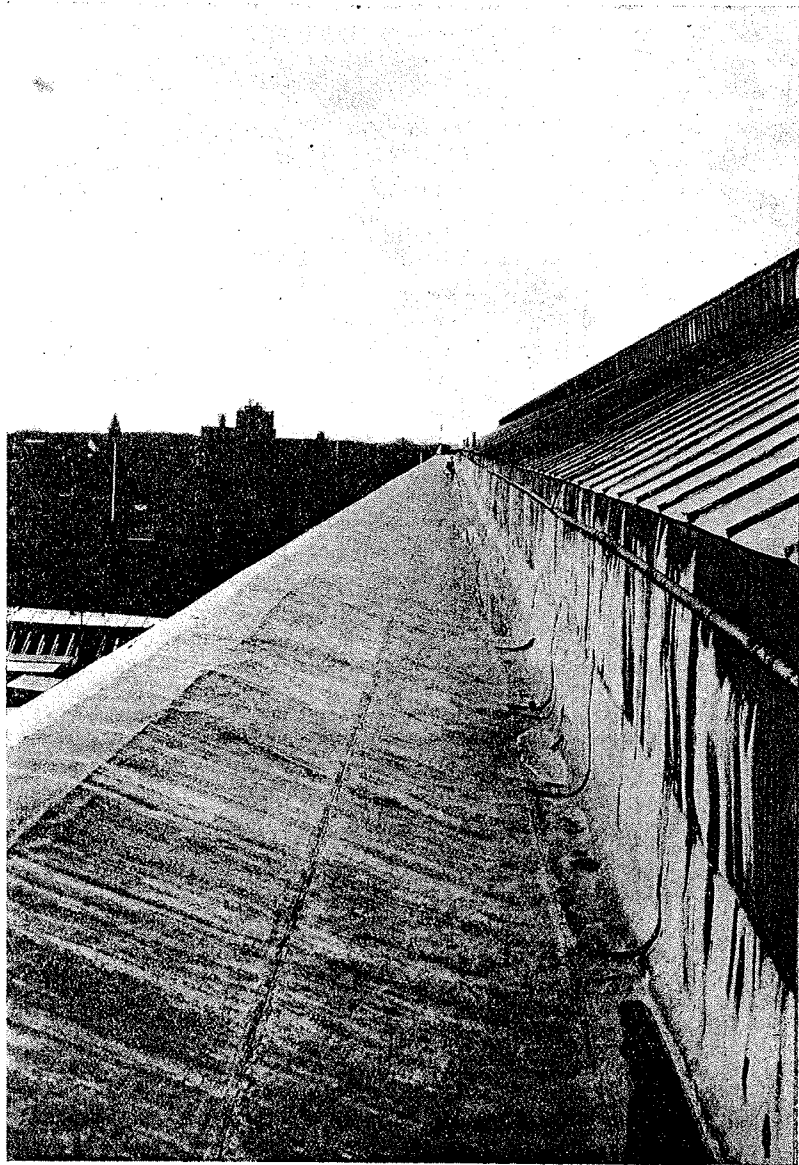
Wide roof gutter along the front of the State Education Building, 590 feet long and nearly 8 feet wide. Note the pools of water.
